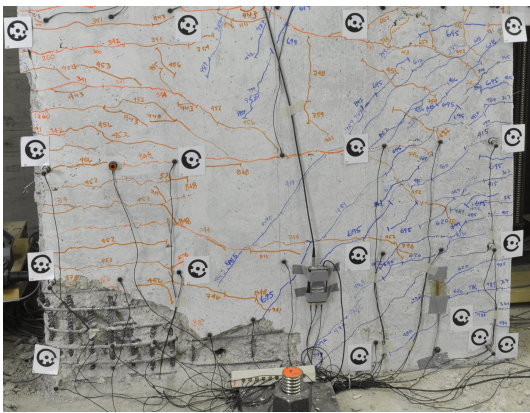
Coupling beam damage at the end of the test (-2.25% Step 1003)
